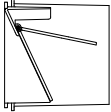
Installation position dimensioned drawing – flush-mounted/surface-mounted axial housing with wall duct and weather protection hood
